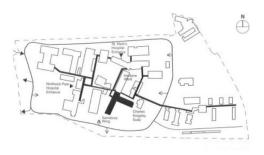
Northwick Park Hospital. Site plan and enclosed street. Figure by [1].
